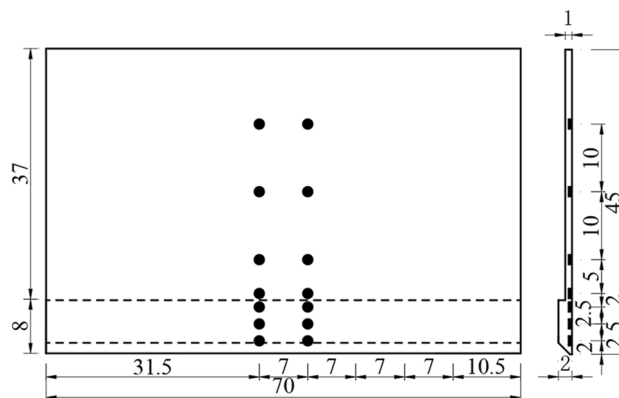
Layout diagram of earth pressure sensor in sidewall (unit: cm).
